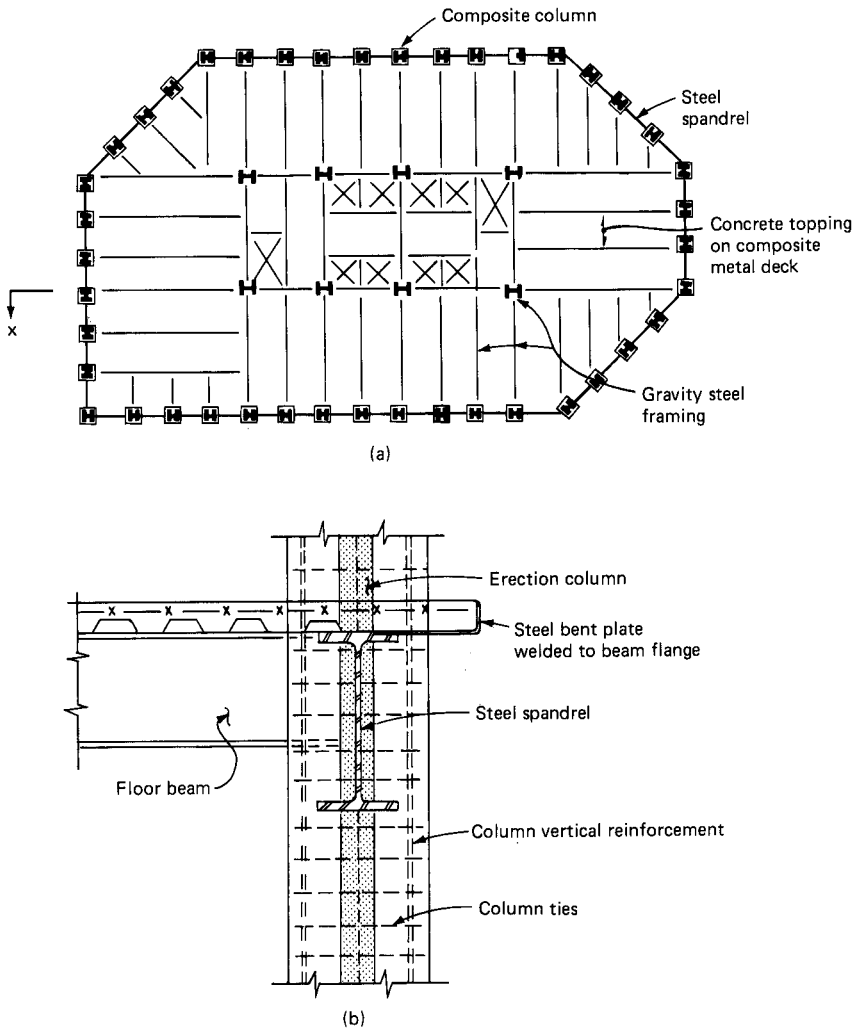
Composite tube with steel spandrels. (a) Typical floor plan; (b) typical exterior cross section.
